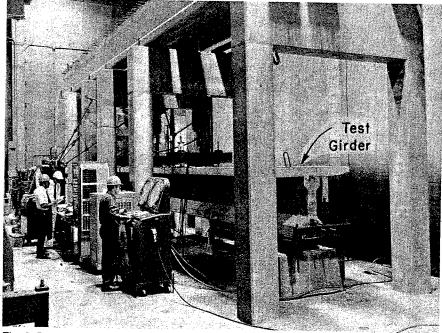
Test setup at Construction Technology Laboratories at PCA.
